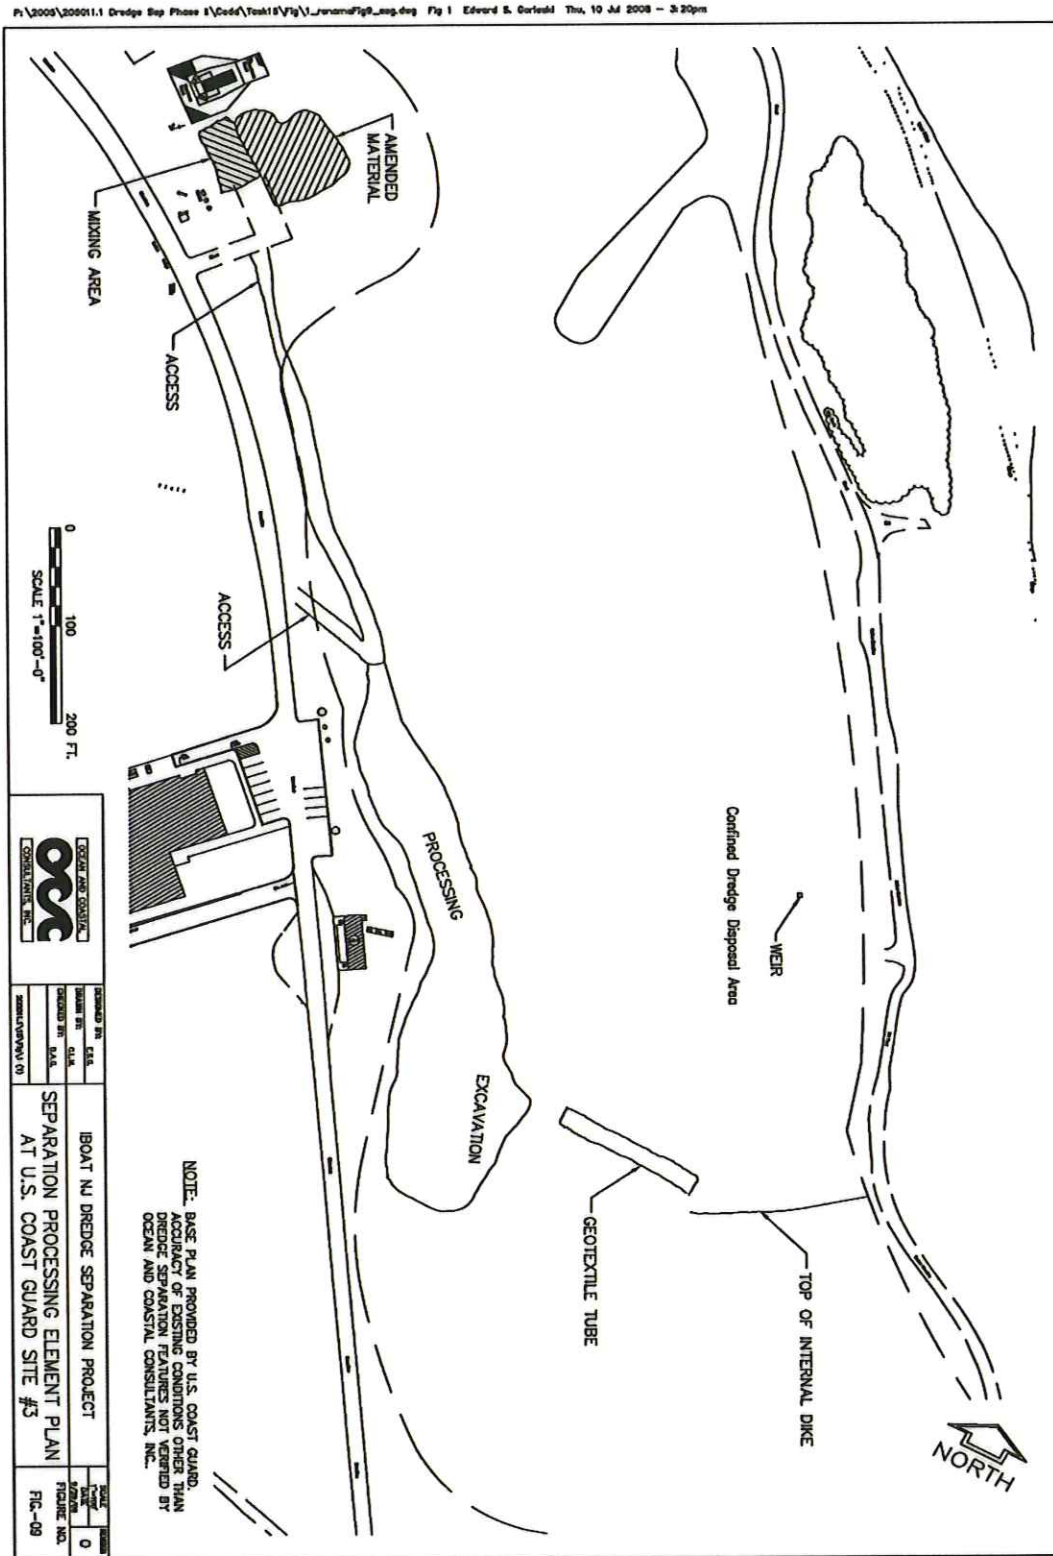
Dredge Separation Demonstration Project Layout - Site #3.
